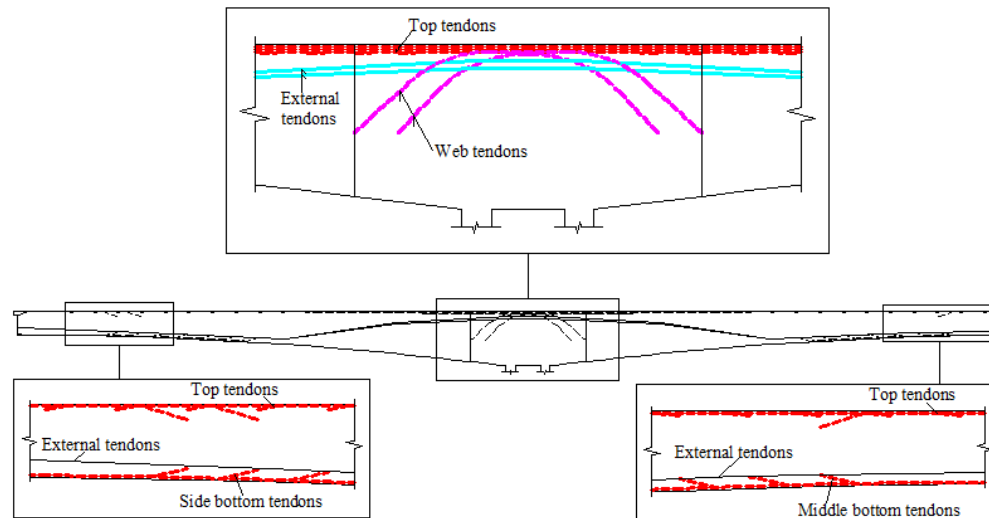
Arrangement of prestressing tendons of PC bridge with corrugated steel web
